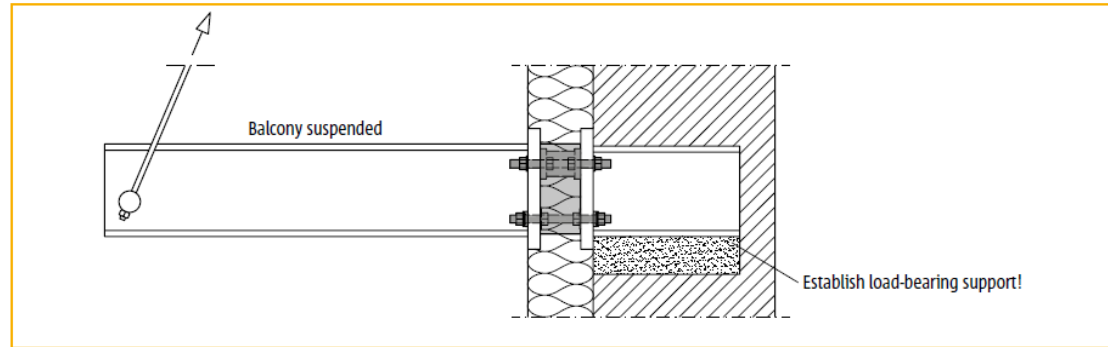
Balcony suspended, connected with KSTZ and KSTQ modules (steel balcony)
